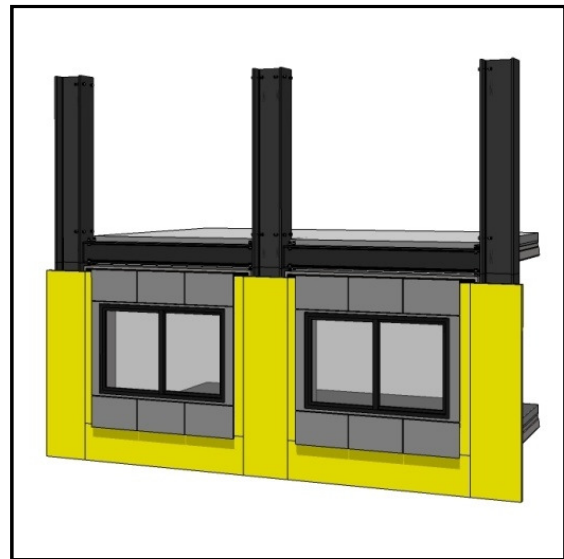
Step 1 and 2 of construction process for semi-integral infilled frame building structure
